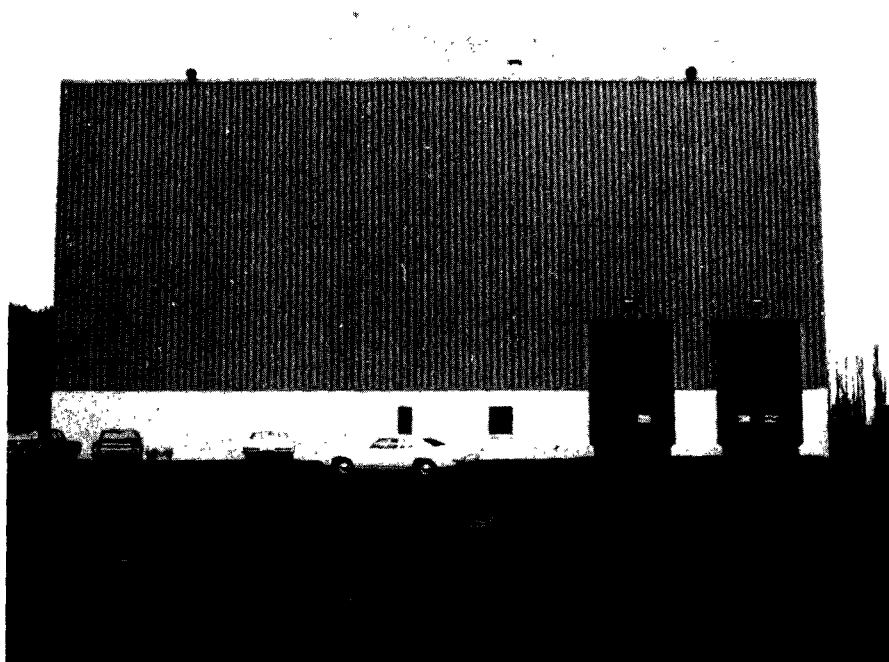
Photograph of plant exterior taken in late April 1971, as asphalt drive and parking area were being installed. Front of plant faces due east.
